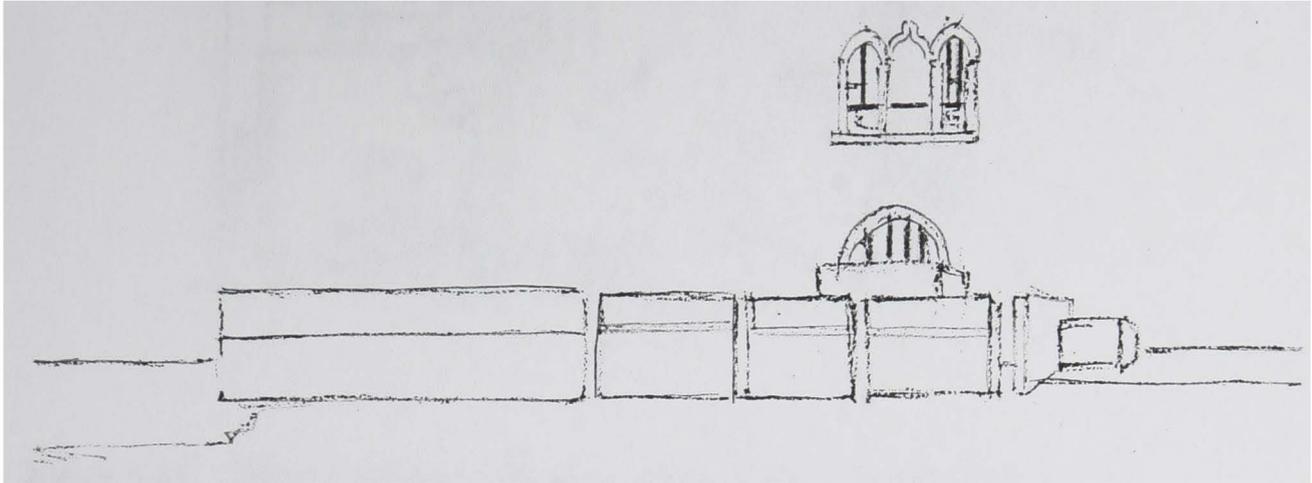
Sketch of details on north facade, Scarpa (1956), Castelvecchio
